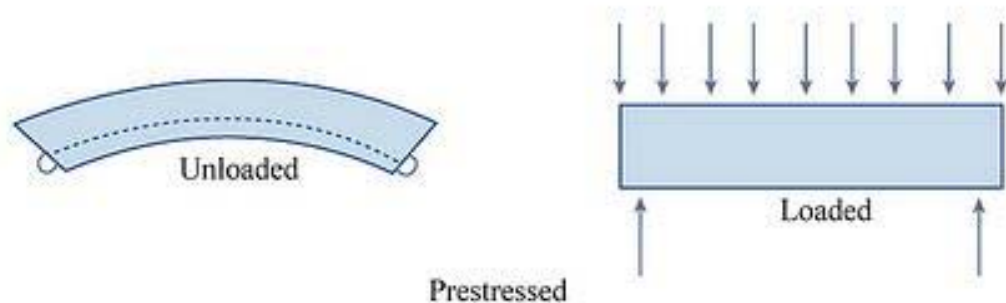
Typical prestressed concrete beam schematic (MIT OpenCourseWare, 2008)
